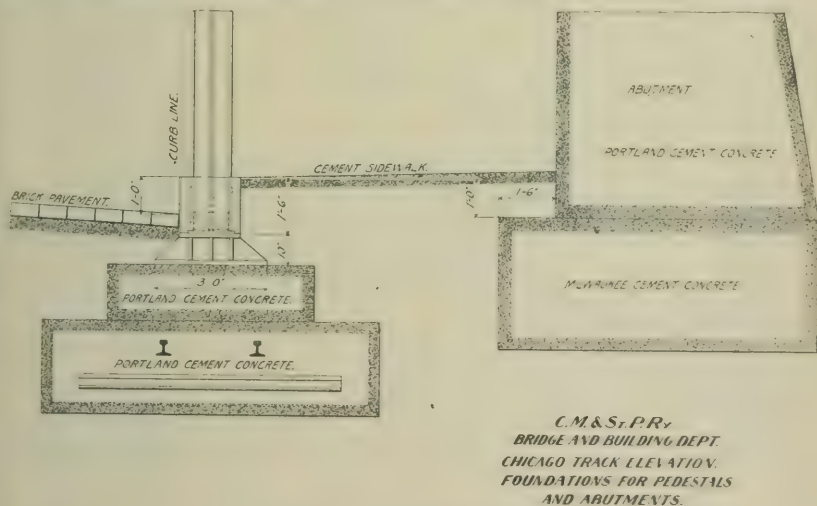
PLAN OF FOUNDATIONS FOR PEDESTALS AND ABUTMENTS.
